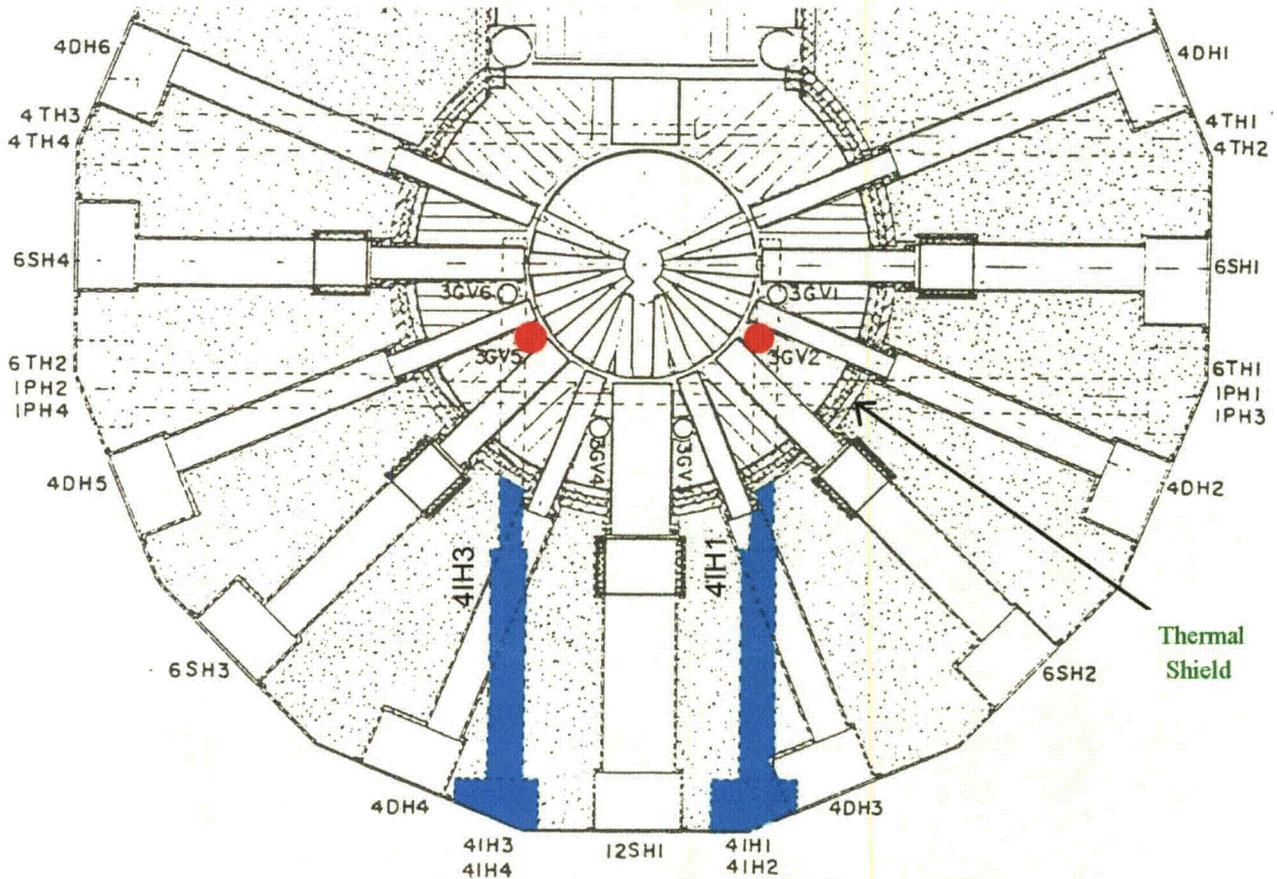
Horizontal Cross-Sectional View of Instrument Port Locations
